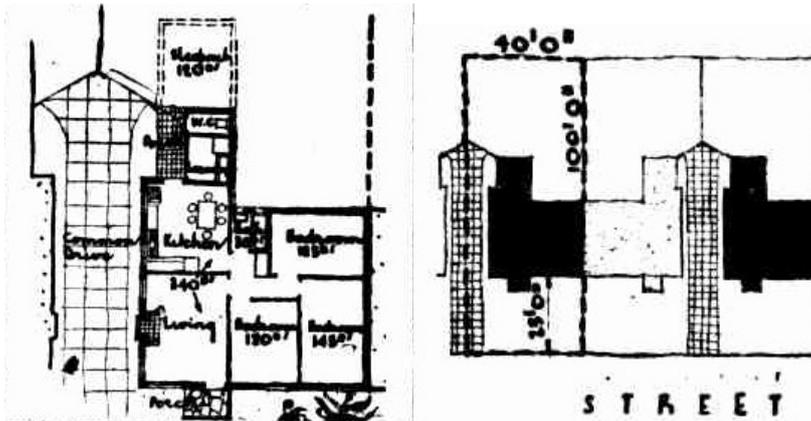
Housing layout and siting plans (*The Argus*, 28 August 1947, p.21)
